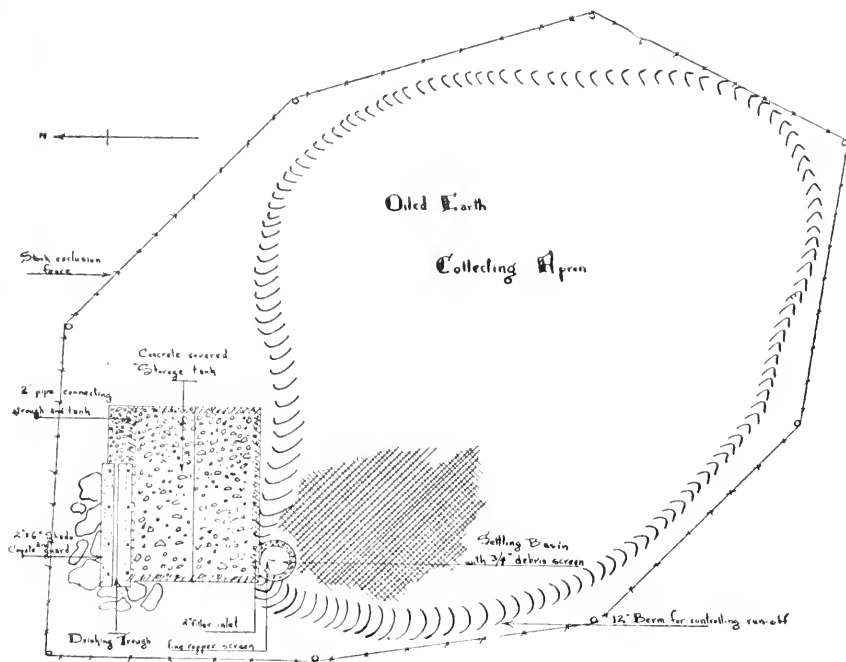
General ground plan for complete installation, showing position of rain collecting apron, shade and coyote guard, and fence.
